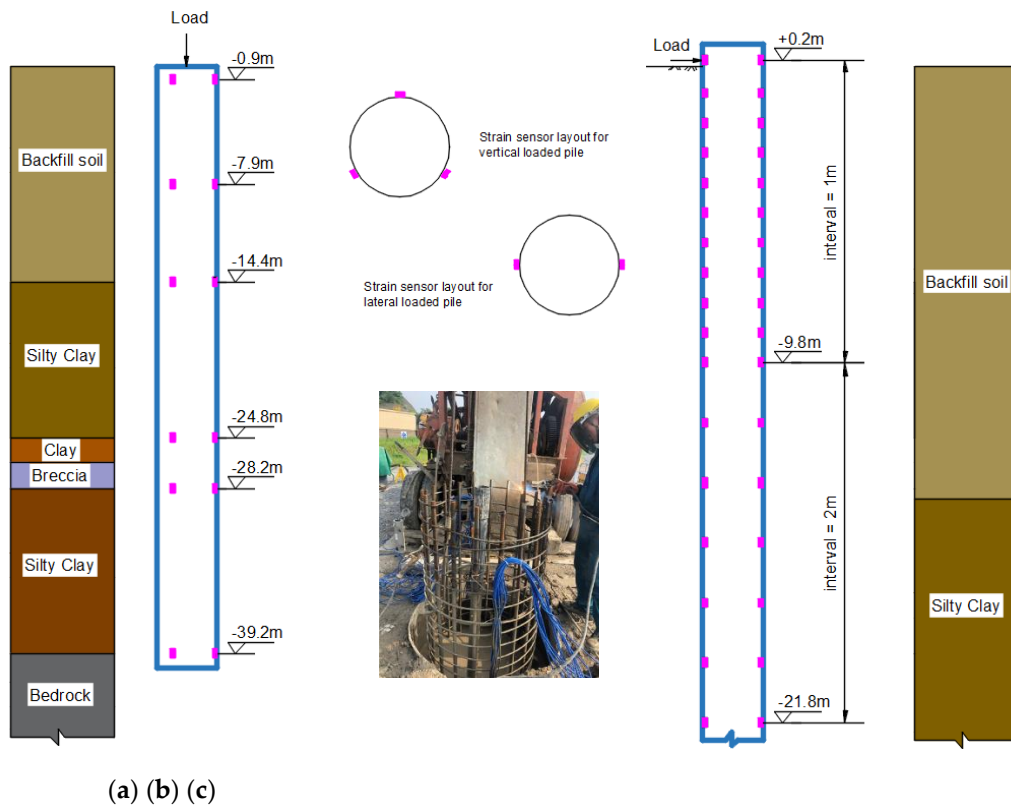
Sensor configuration on the test pile: (a) on the vertical loaded pile SZH1; (b) layout on cross-section and field installation; (c) on the horizontal loaded pile SZH2.
